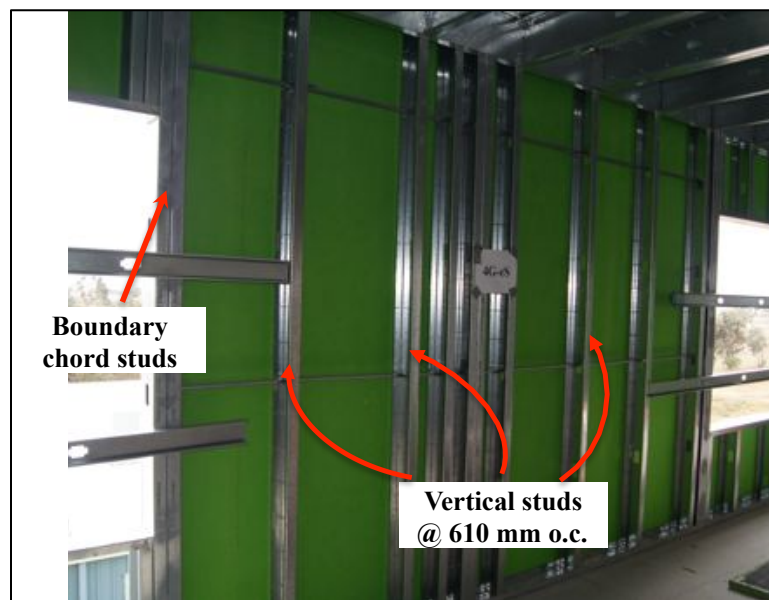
Exterior non-shear gravity wall CFS framing (view from building interior).
